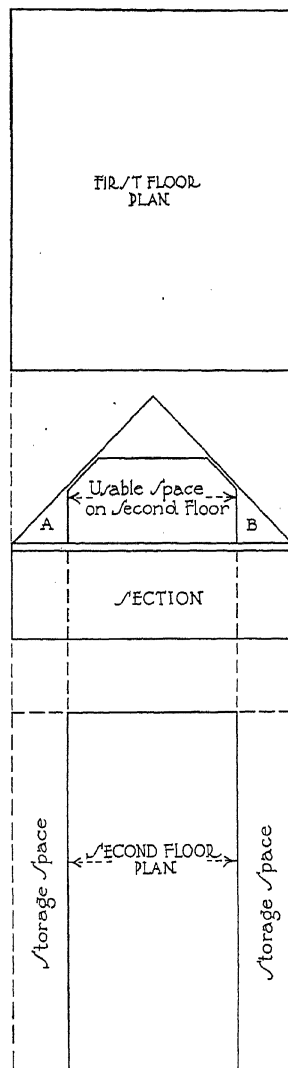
Steps in drawing plans of a story-and-a-half house.
